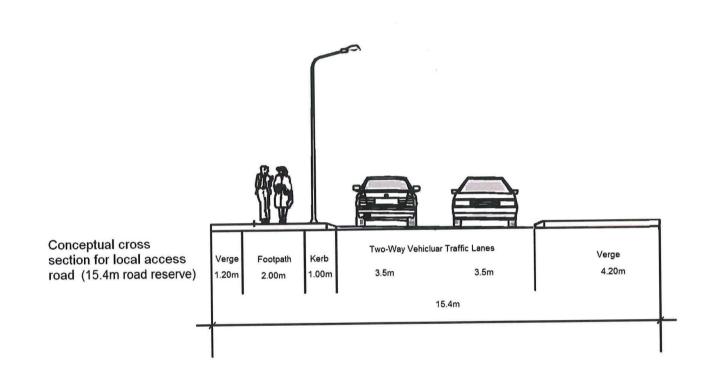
INDICATIVE CROSS SECTION (15.4m) ROAD
